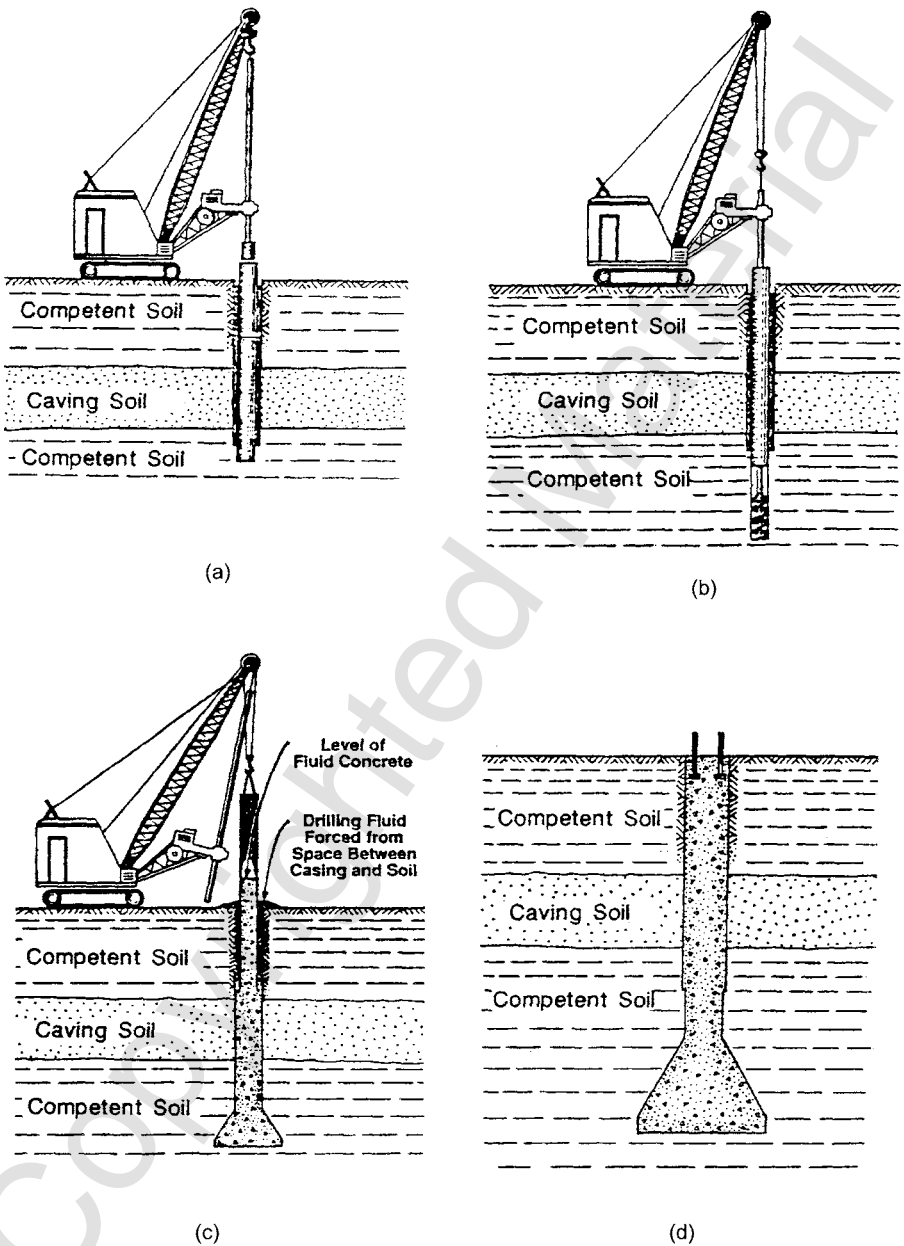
Casing method of construction of drilled shaft: (a) slurry used to penetrate caving soil and casing placed; (b) smaller auger used to drill through casing; (c) casing retrieved after drilling underream; (d) completed shaft (from Reese and O'Neill, 1988).
